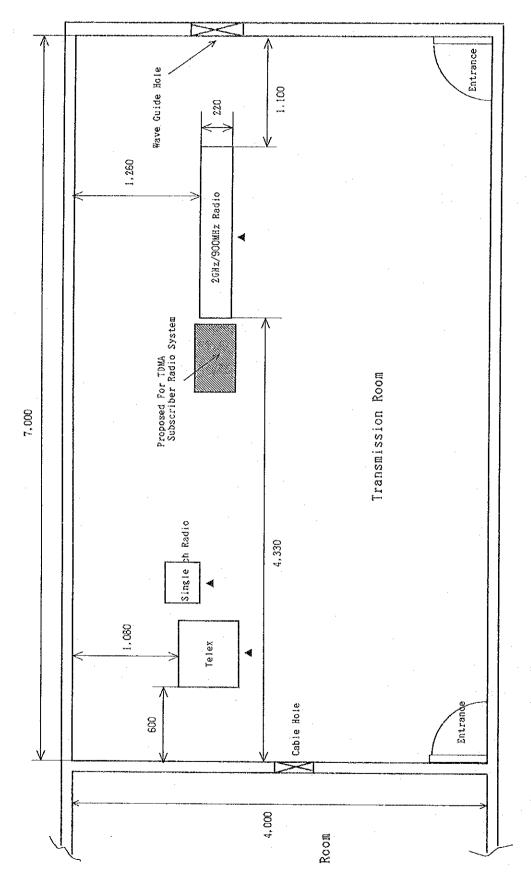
Equipment Layout Plan for MATSAPHA Exchange Office
